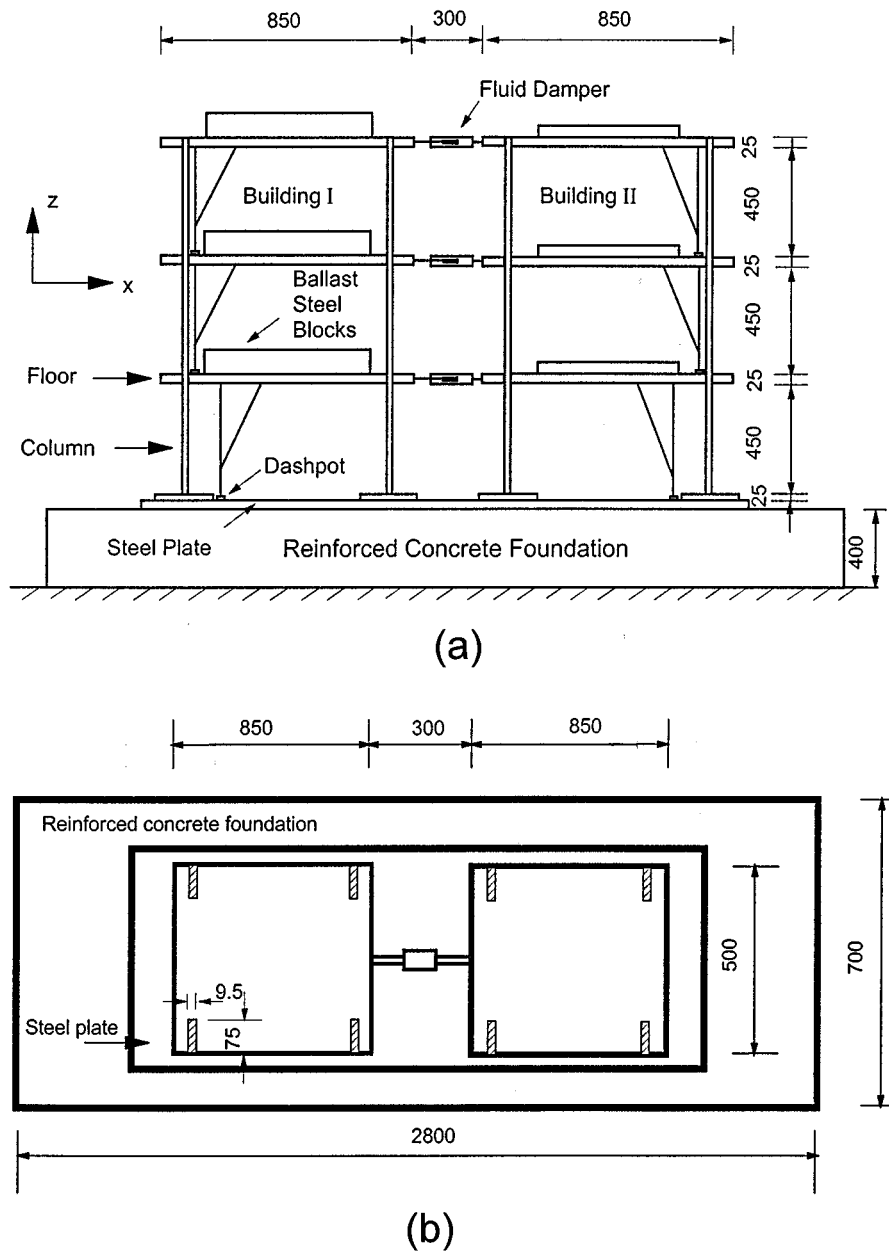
Configuration of adjacent building-fluid damper system: (a) elevations; (b) plan (all dimensions in mm)
